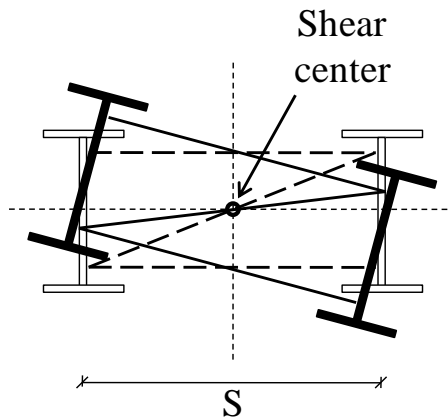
Rigid body rotation of twin girder with stiff cross frame
